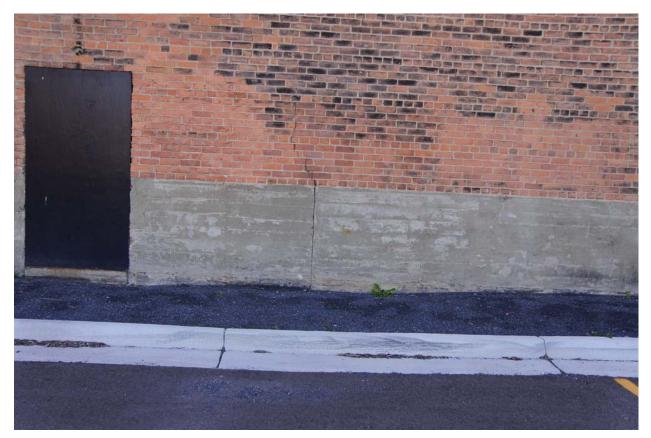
Cracks in exterior brick wall above joint in concrete foundation wall. The bricks above the concrete should be re-worked so that a control joint in the brick corresponds to the joints in the foundation wall.
